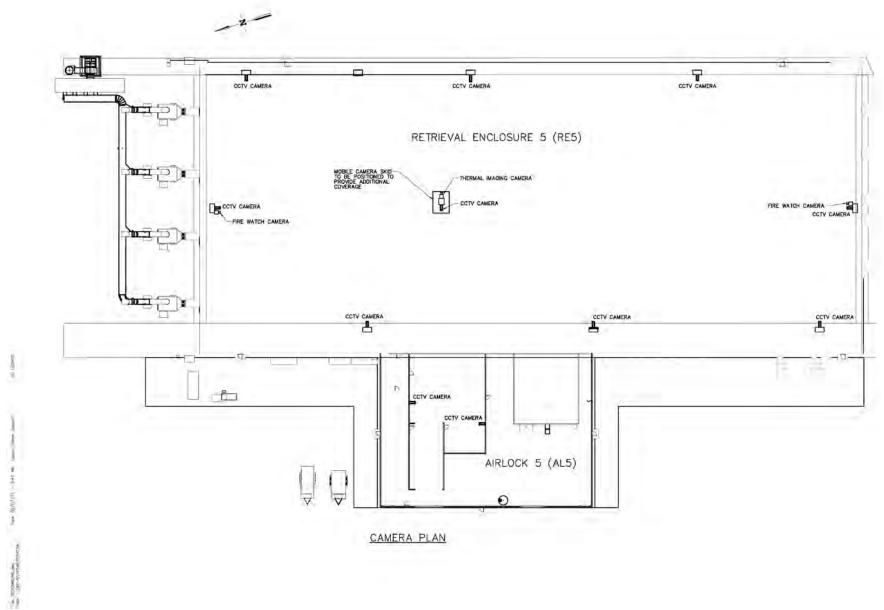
WMF-1617 Retrieval Enclosure Camera Plan
